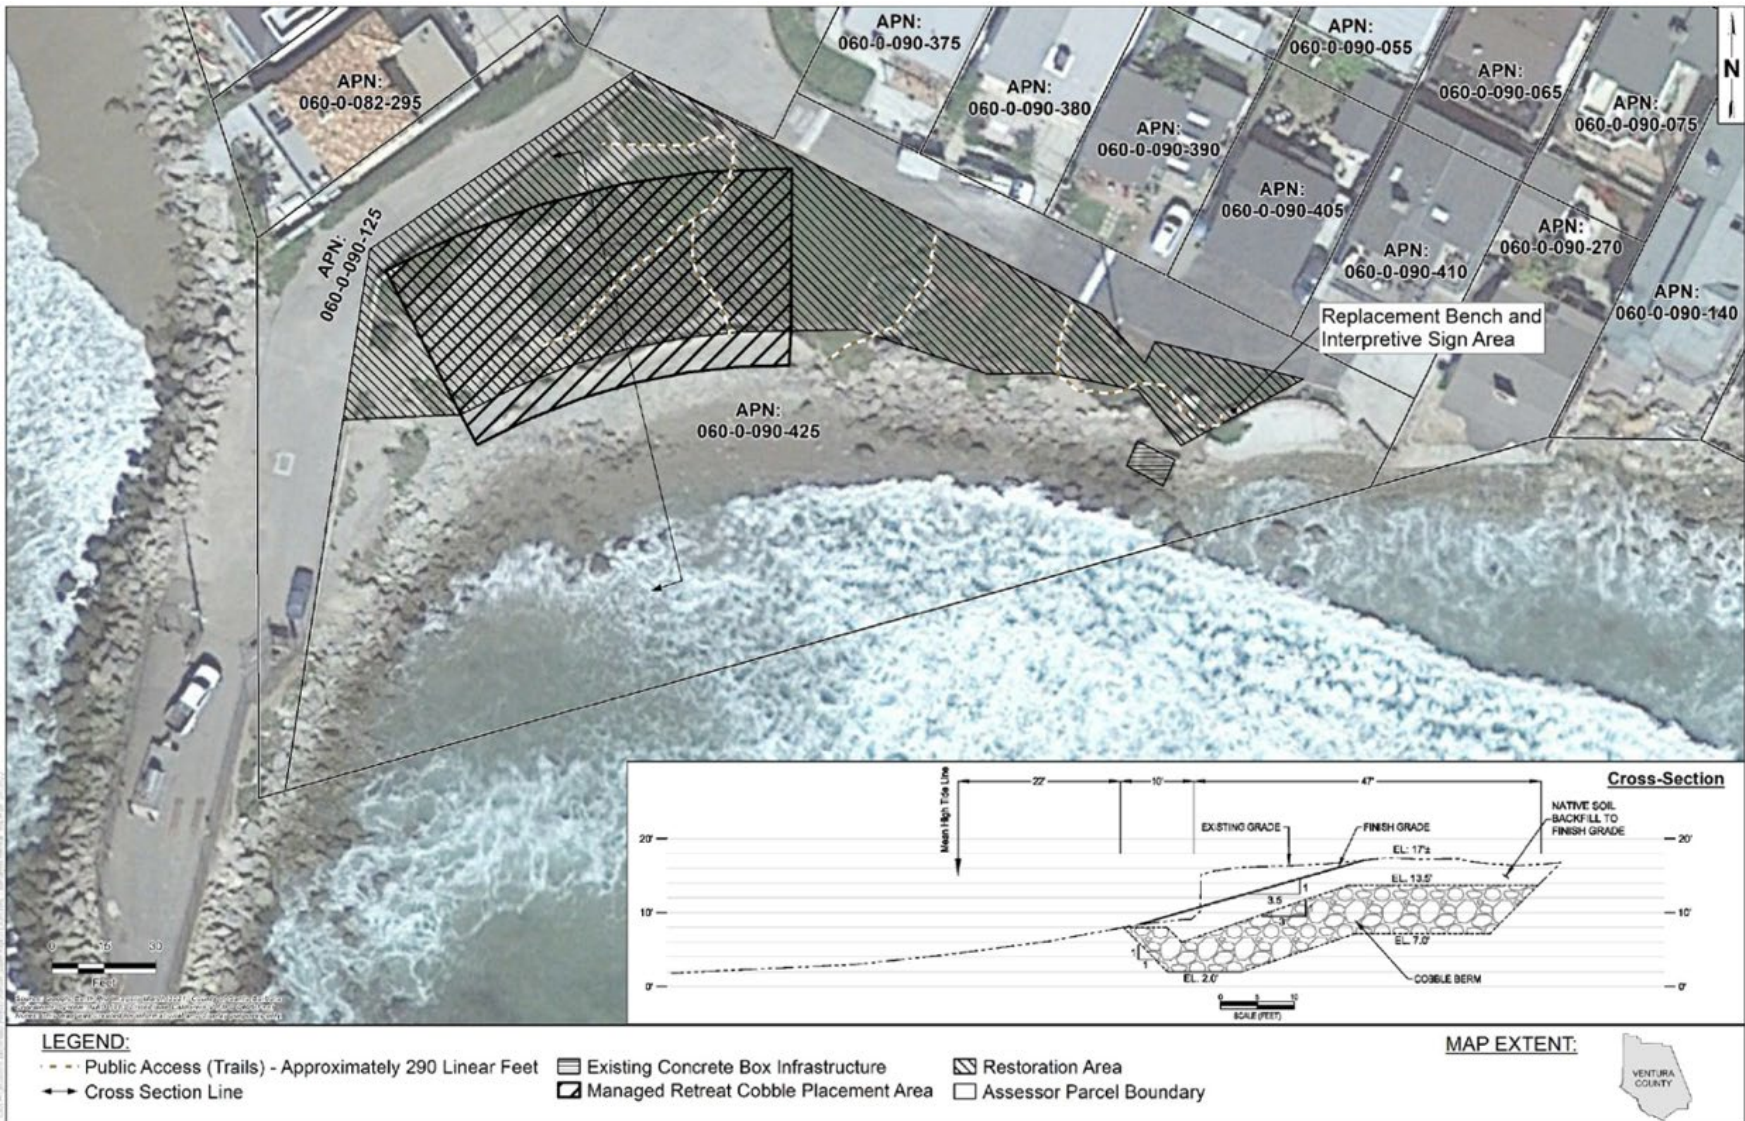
Plan and cross-section view of Alternative 9B (State Lands Commission).
